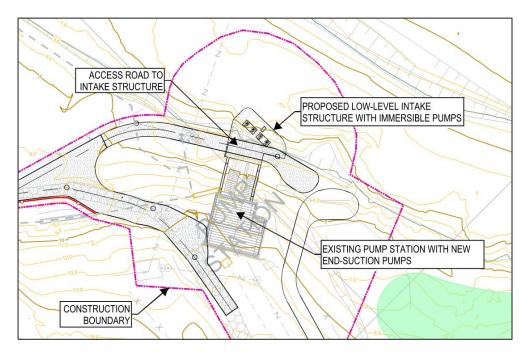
Preliminary Pump Station Layout (2014 – 2016)
